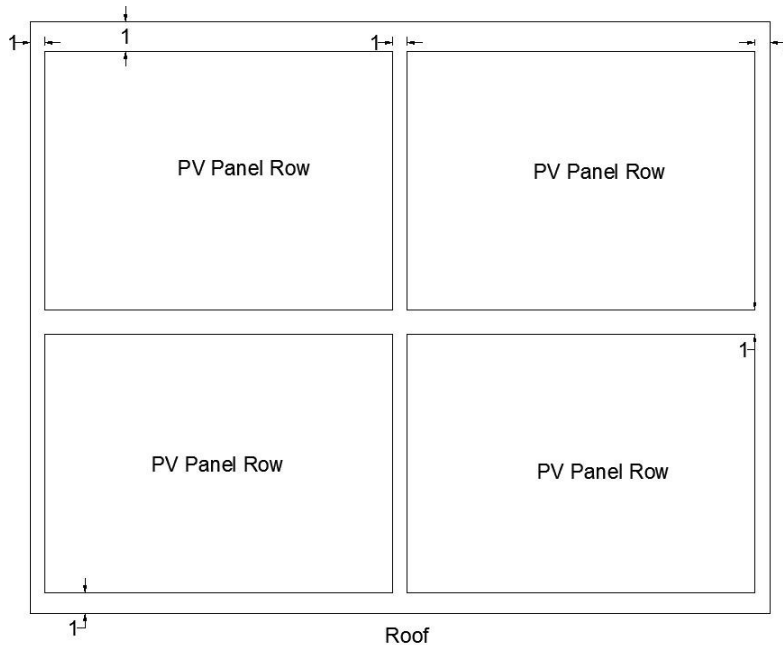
Rooftop solar PV system layout with safety measures (meter)
